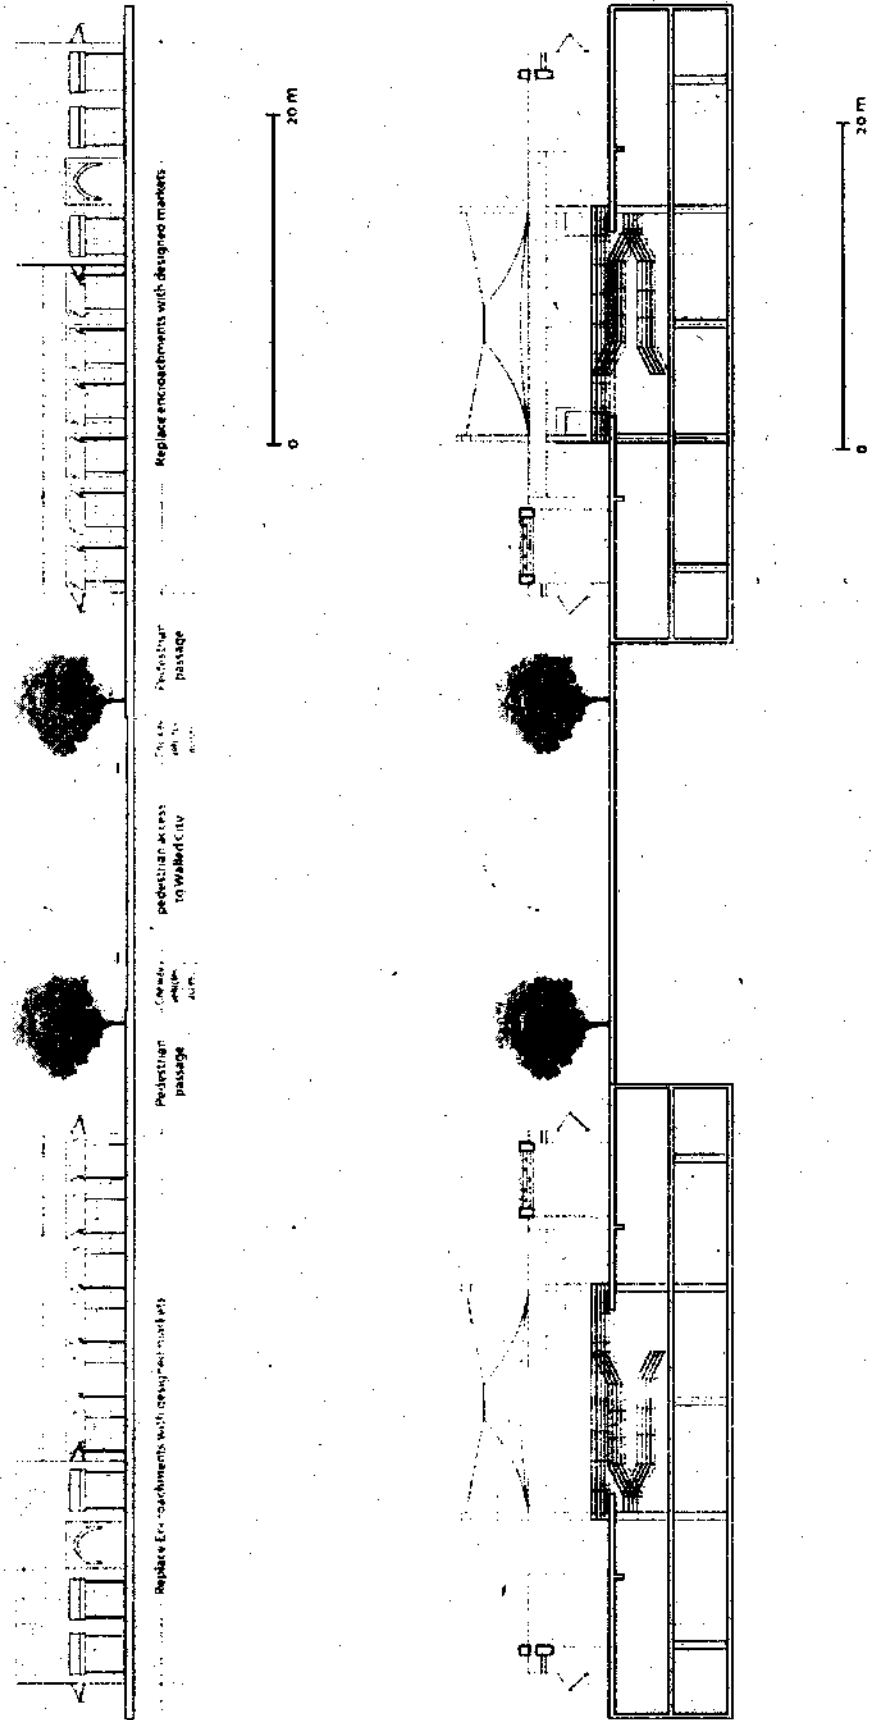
SECTION OF EASTERN CIRCULAR ROAD OPPOSITE ARBARI GATE SHOWING PROPOSED SMALL TRUCK LOADING / UNLOADING DOCKS TO SERVICE EXISTING BUSINESSES OUTSIDE THE WALLED CITY
